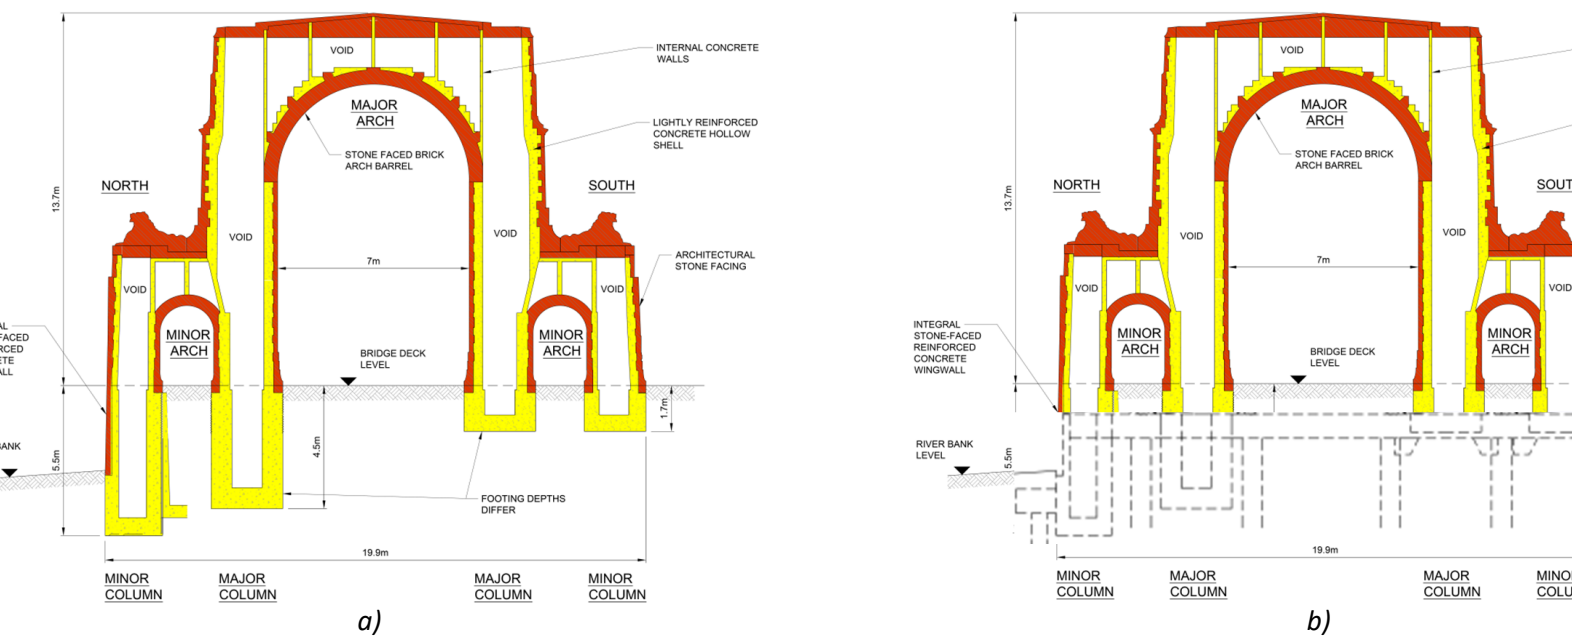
Cross section through existing structure indicating: a) varying existing foundation depths; b) new piled foundation
